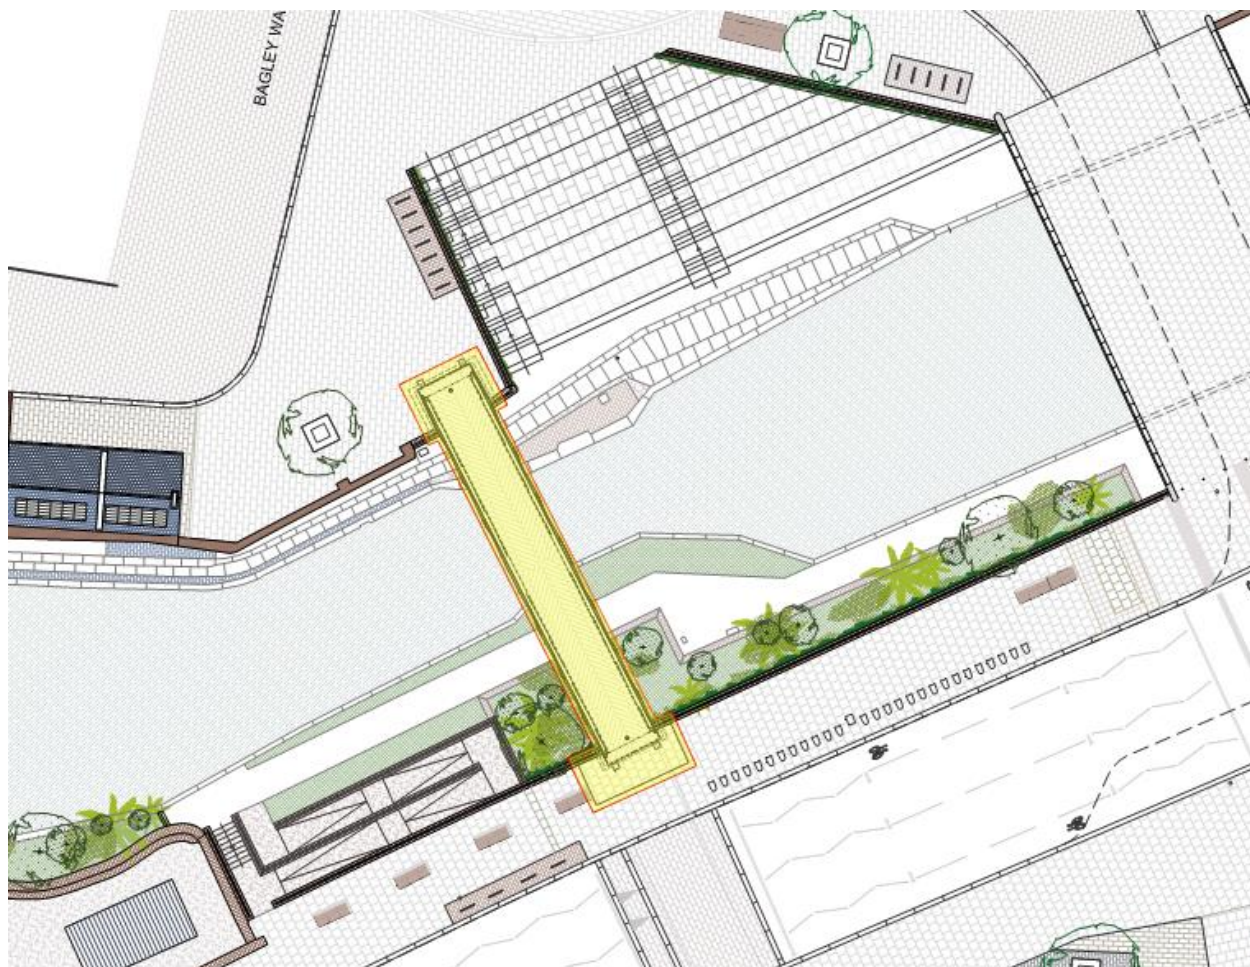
Site plan for Bridge 2 in yellow and planning boundary in red
